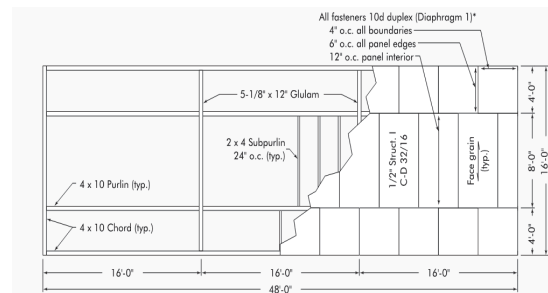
APA Report 138 Diaphragm Construction Details, Diaphragm 1 [7]
